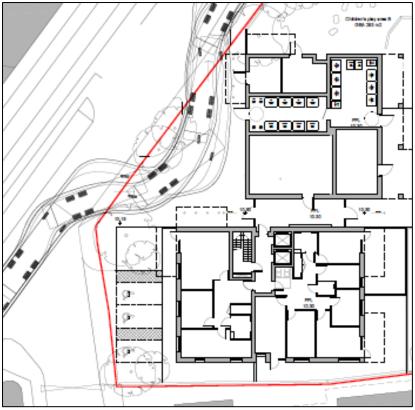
Proposed Ground Floor Layout - Servicing Arrangements
